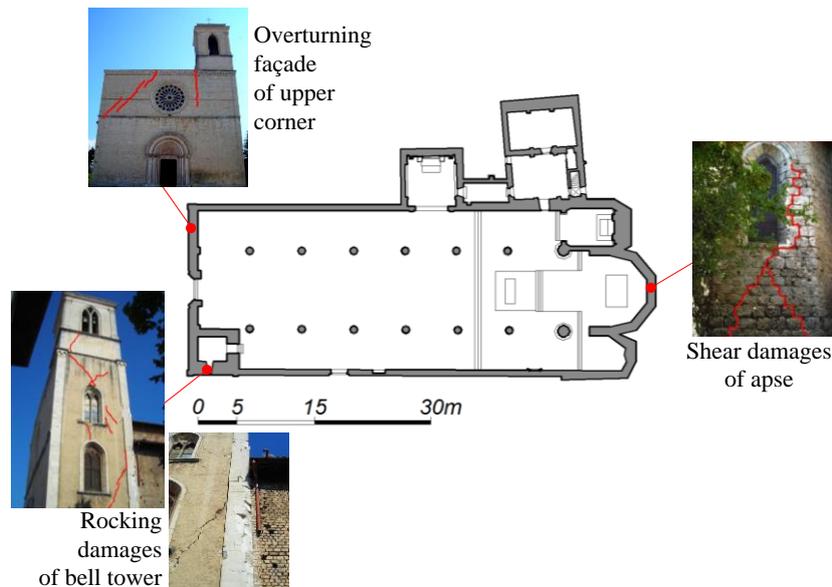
San Silvestro church (SS): damage after the 6th April 2009 earthquake.
